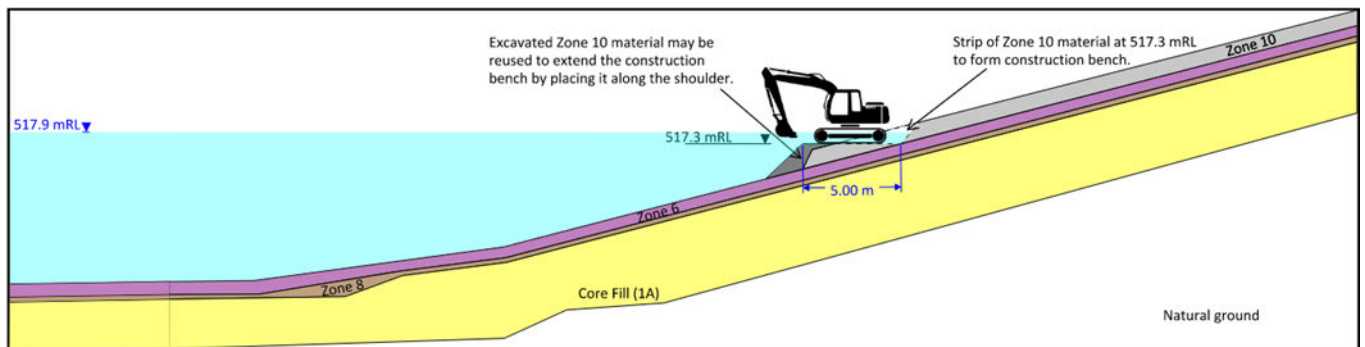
Schematic sketch – Tranche 1 – abutments – establishment of construction bench at 517.3 m RL – Not to Scale
